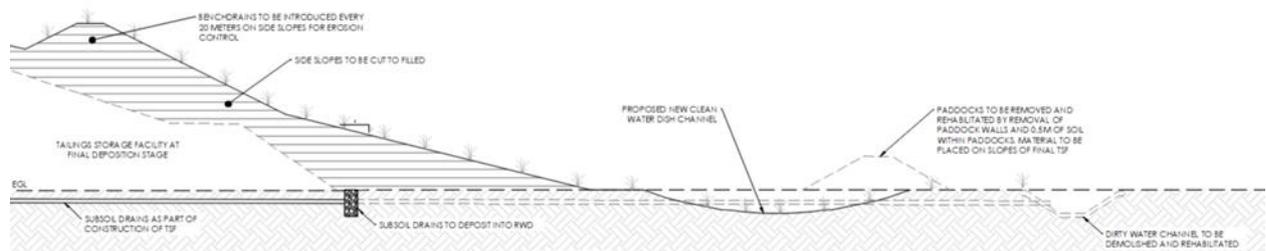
Detail of proposed stormwater infrastructure (MineLock, 2026).
